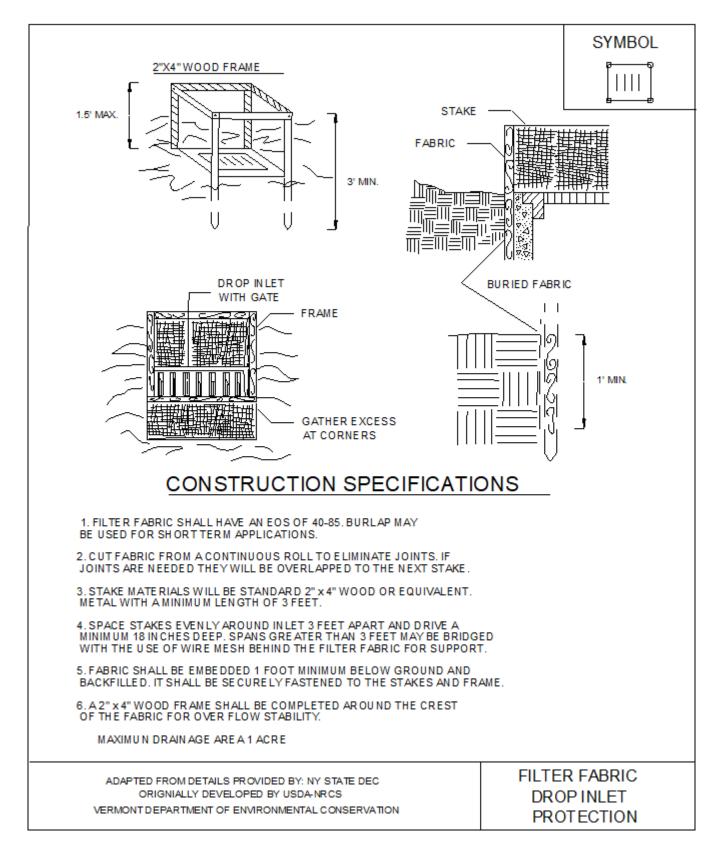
Storm Drain Inlet Protection: Filter Fabric
